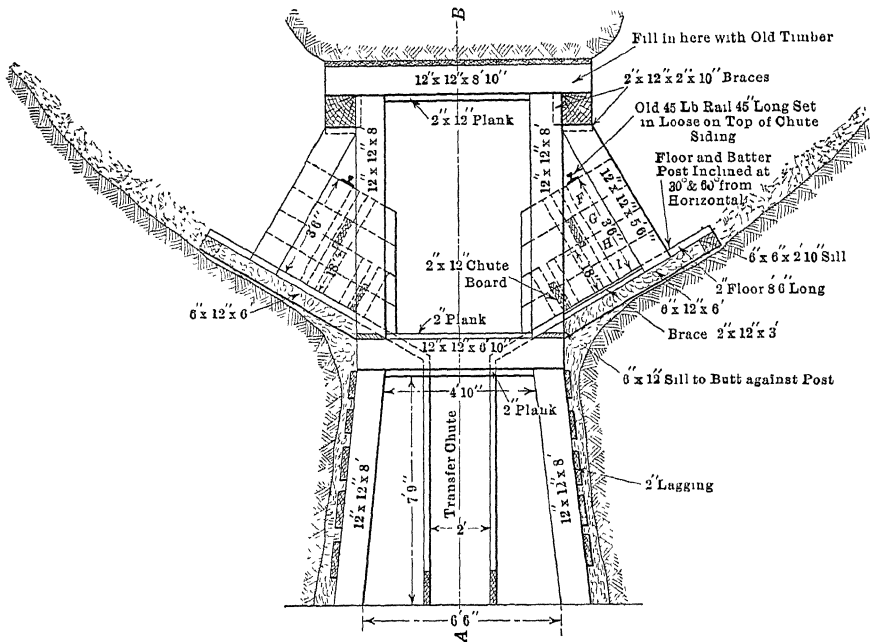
ELEVATION OF PILLAR PONY SET, DRAWING-OFF LEVEL.
